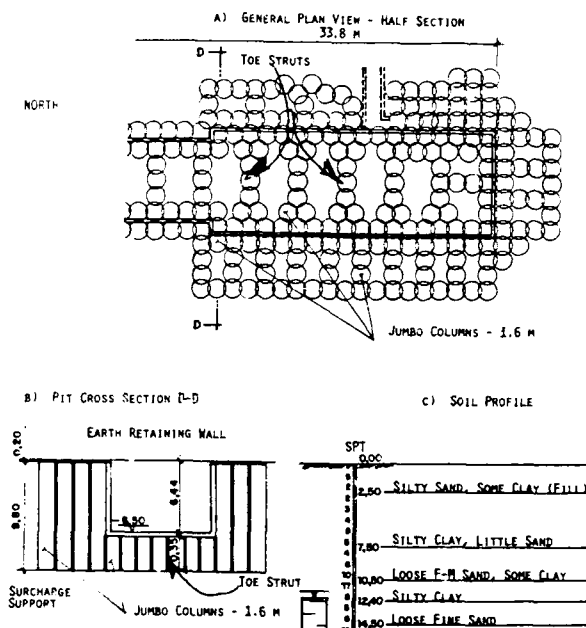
General Plan and Profile of General Motors Stamping Mill Pit
